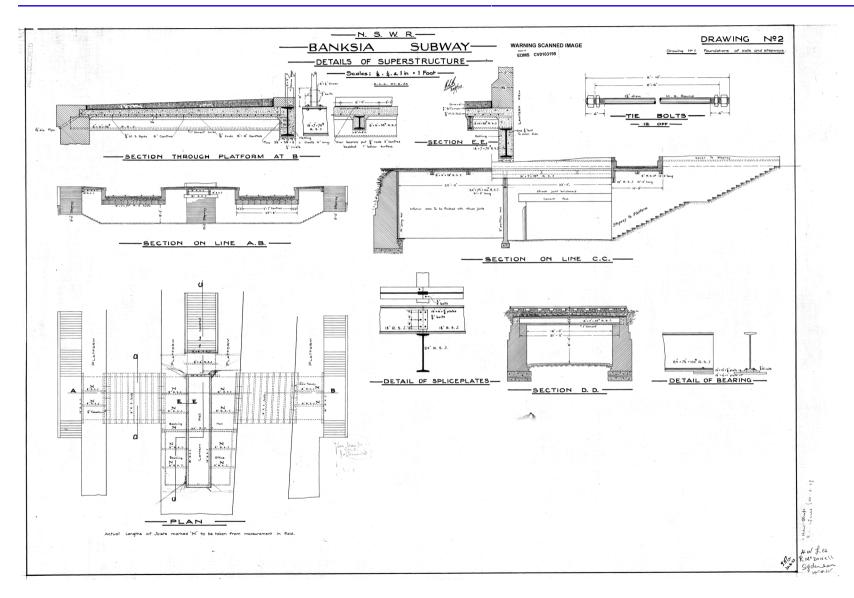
N.S.W.R Banksia subway – details of super structure (Source: Sydney Trains plan room)
